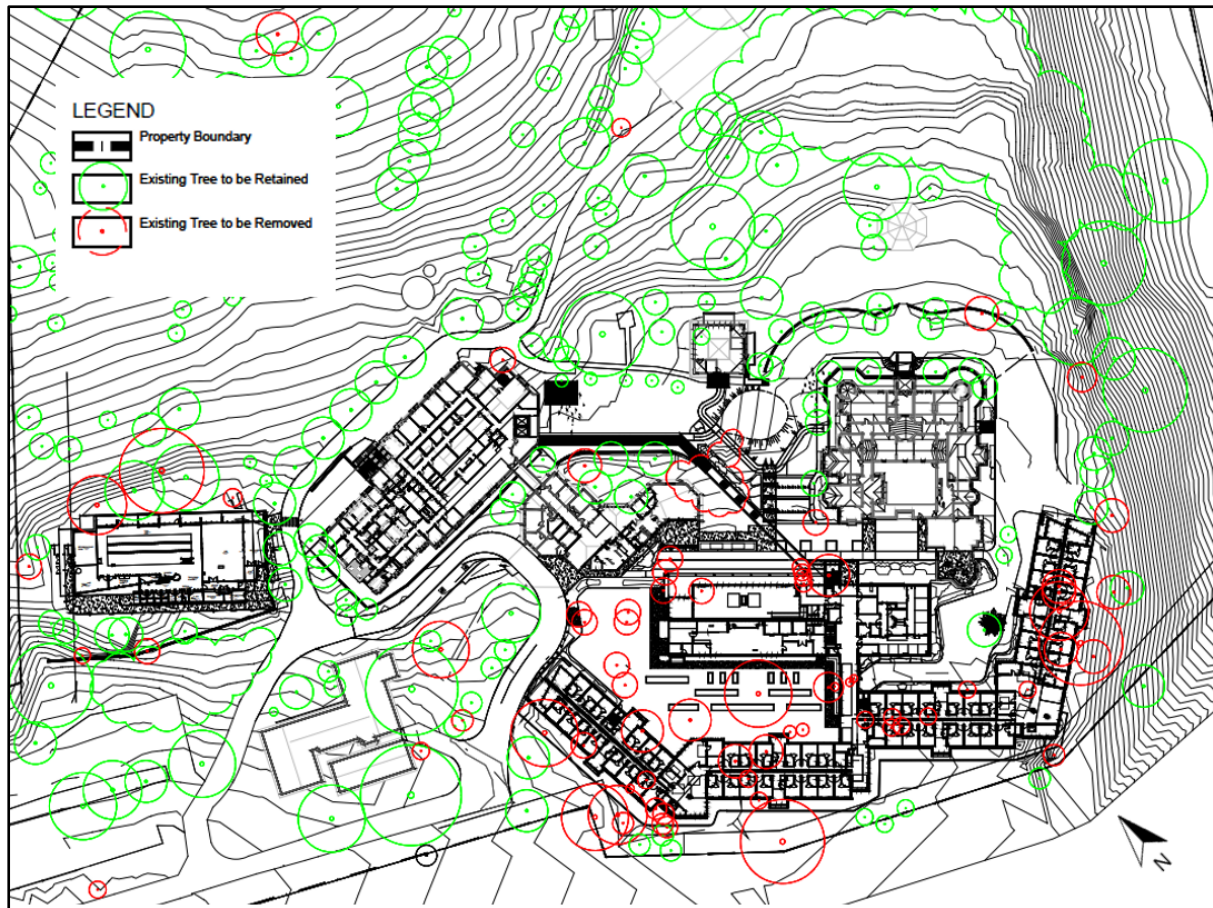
| Tree removal plan (Source: Applicant's SRtS)
